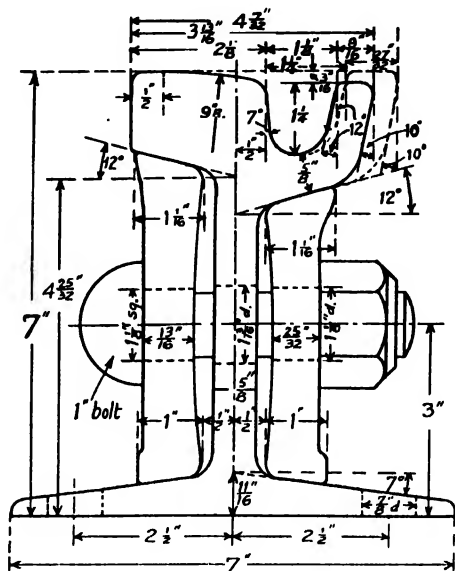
Dimensions of B.E.S.A. No. 8 Tramway Rail and Fish-plates. NOTE—Fish-plates are 2 ft. long and are fastened with six bolts.
